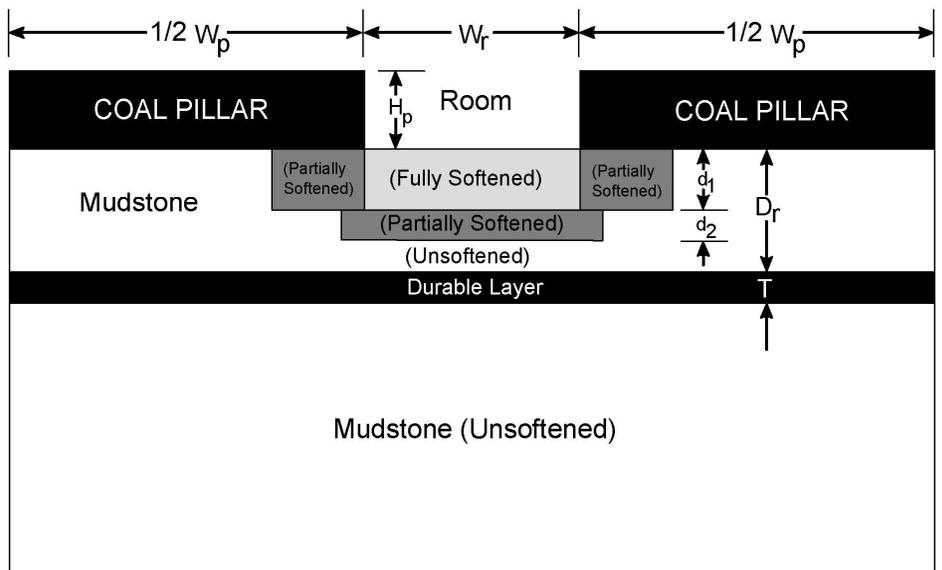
FLOOR SOFTENING MODEL USED TO ASSESS MINE FLOOR BEARING CAPACITY
